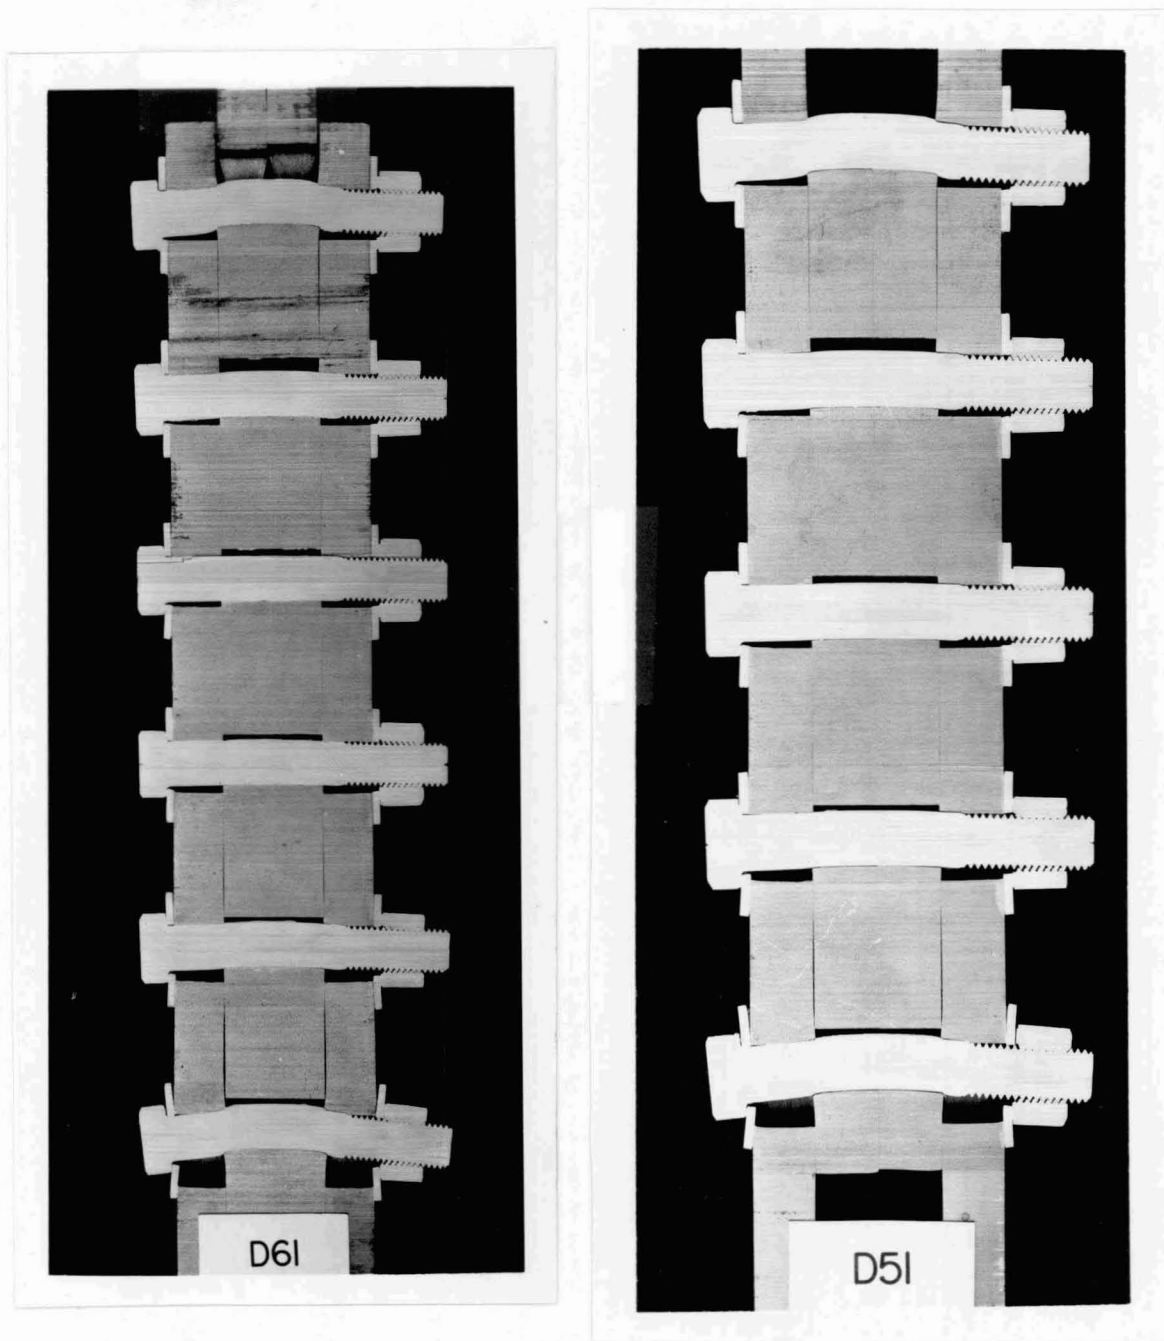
SAWED SECTIONS OF JOINTS D61 AND D51
